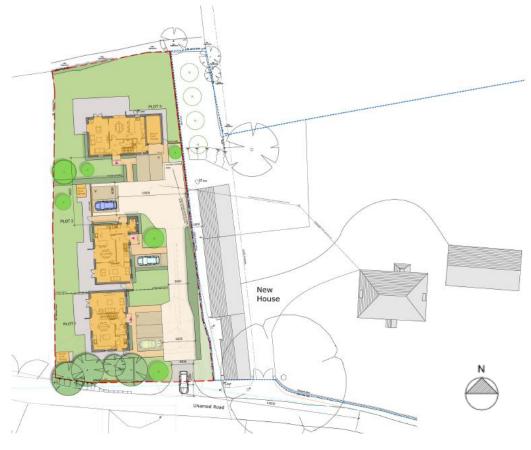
Proposed Site plan. Plots 1 & 2 are orientated north –south on the western boundary, and the larger plot 3 to the north of the site.
